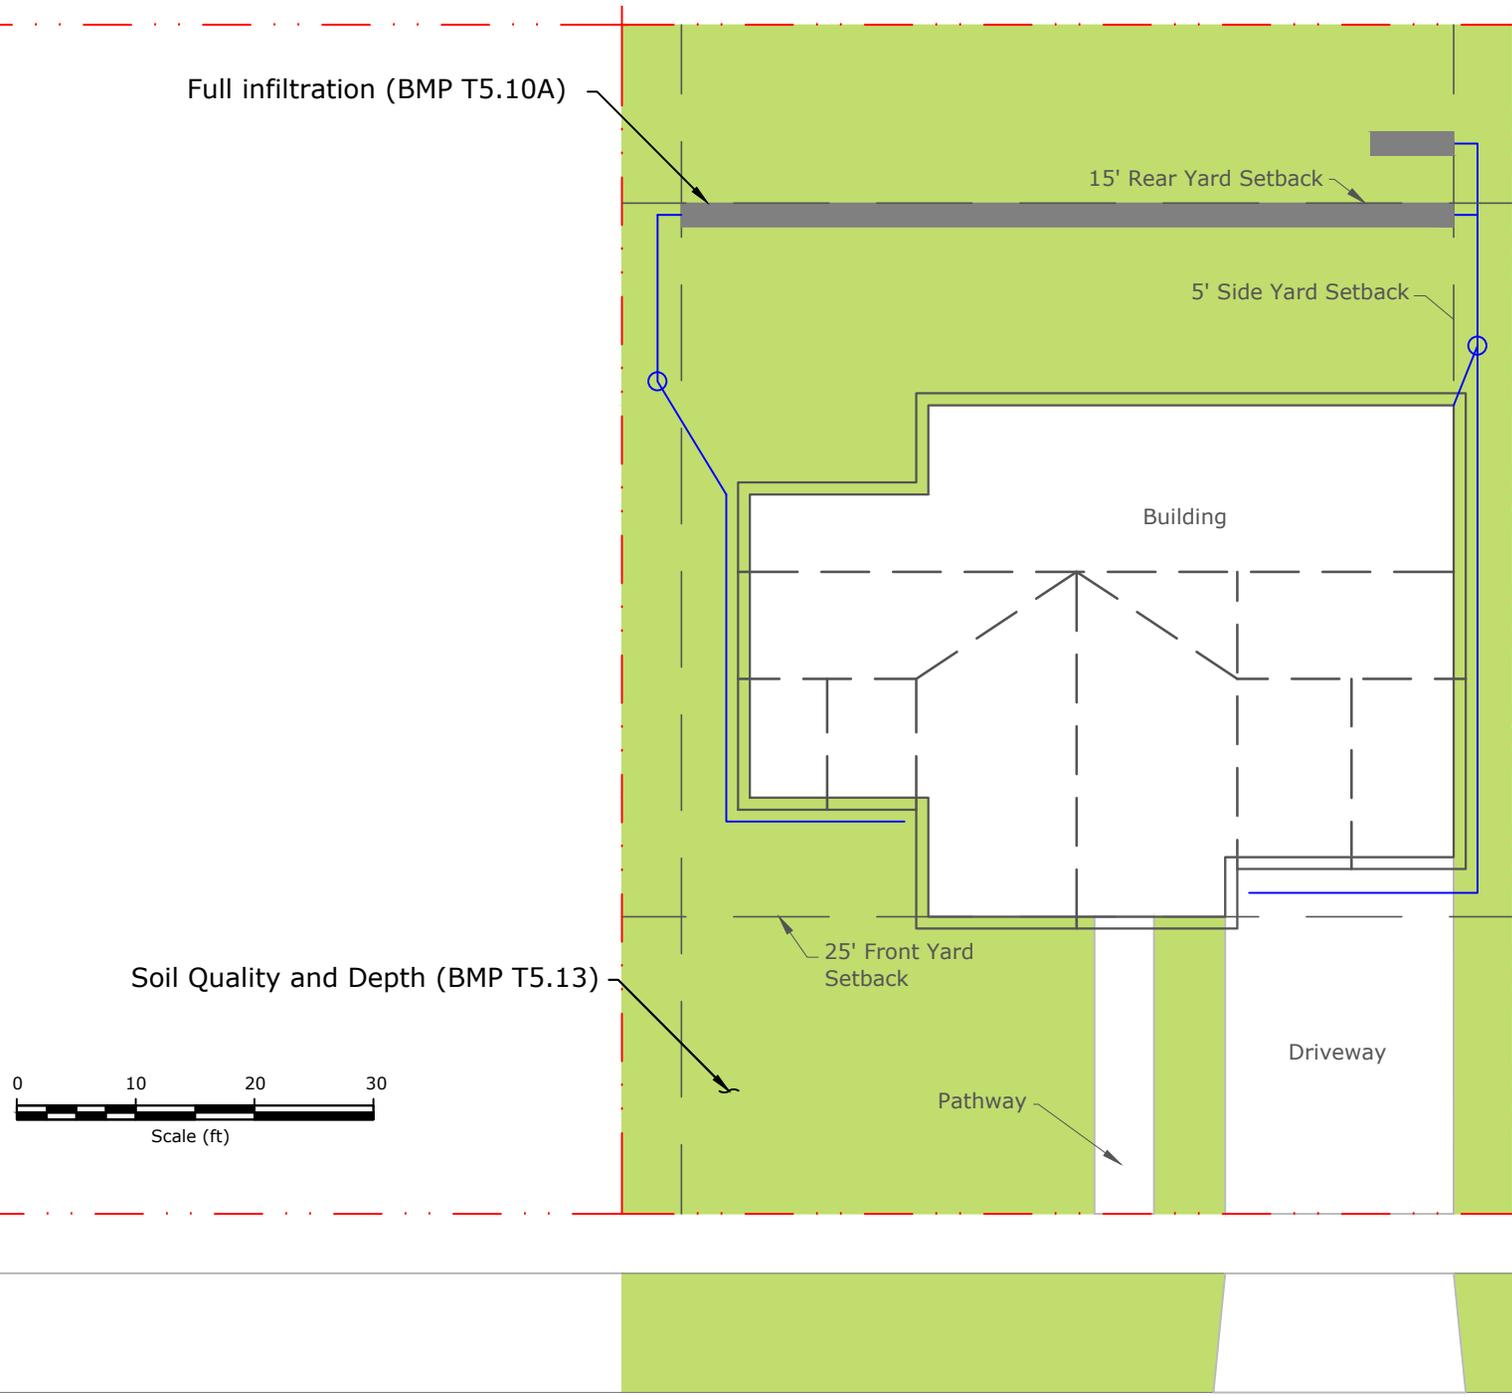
Scenario 3. Permanent Stormwater Site Plan - Typical Single-Family Residential Parcel, 2012 Requirements, Outwash Soils
